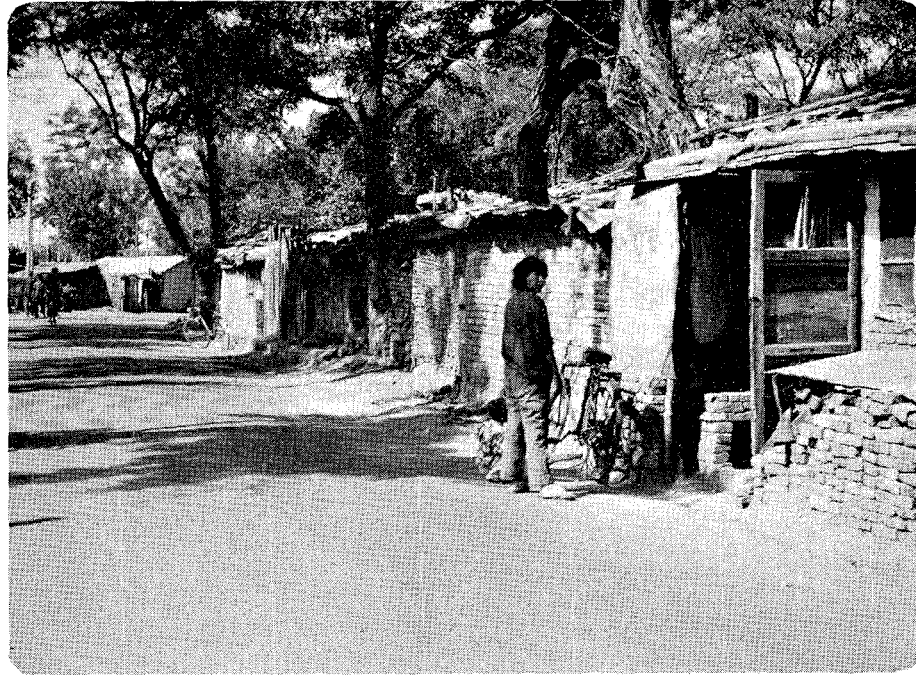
Temporary housing in Tangshan constructed of the rubble from collapsed buildings. The walls are braced with wood timbers, and the roofs are light-weight.
